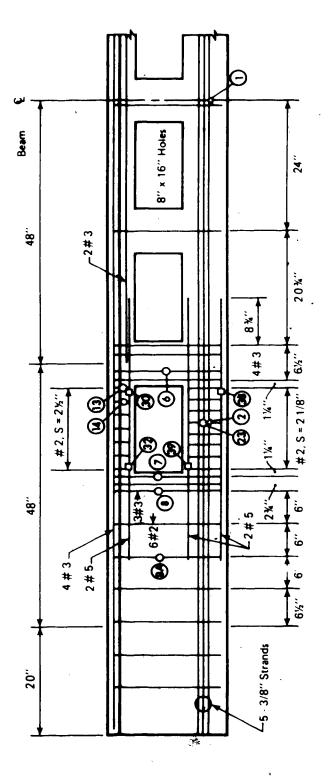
Reinforcement Details and Strain Gage Locations for Beam 28-16-4
